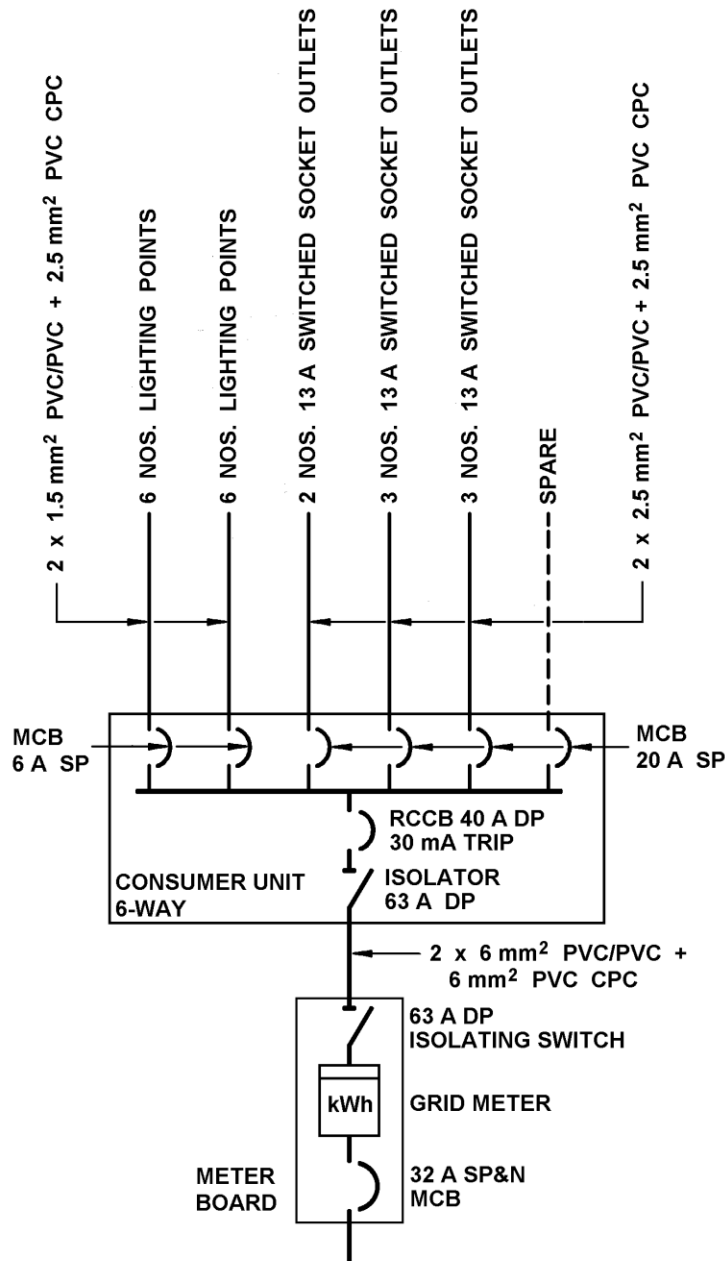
Typical Single-Line Diagram of Electrical Installation to 5-Room Apartment
